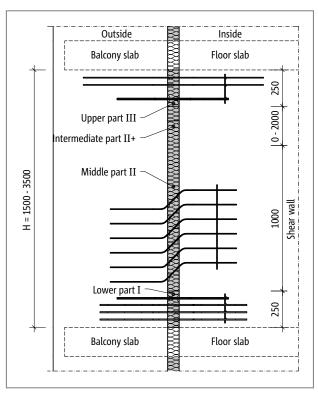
Schöck Isokorb® T type W: Layout; Balcony structure with thermally insulated load-bearing shear walls
